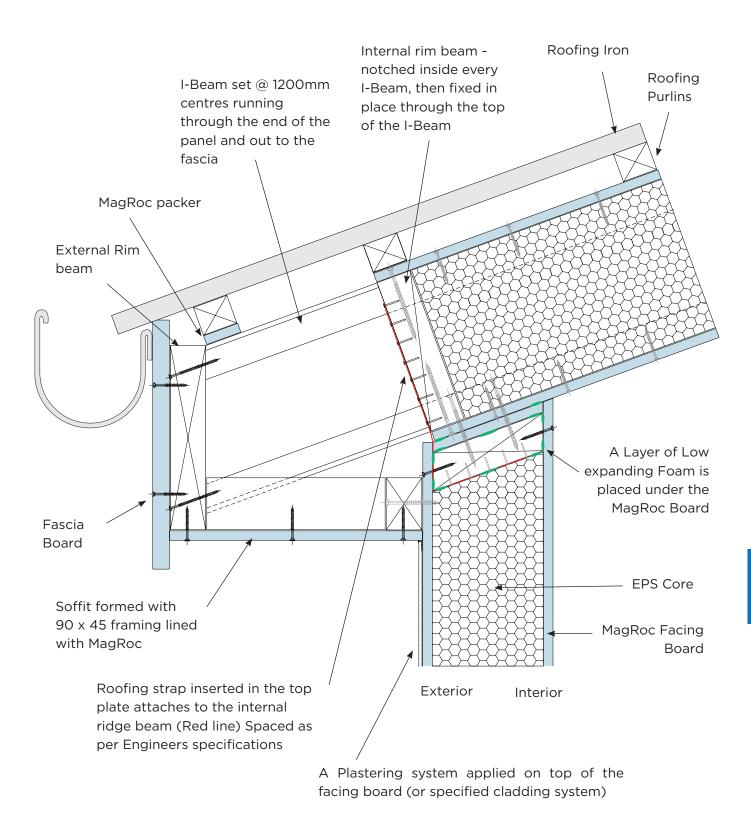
MagRoc 'Typical' Truss Roof Square Soffit
